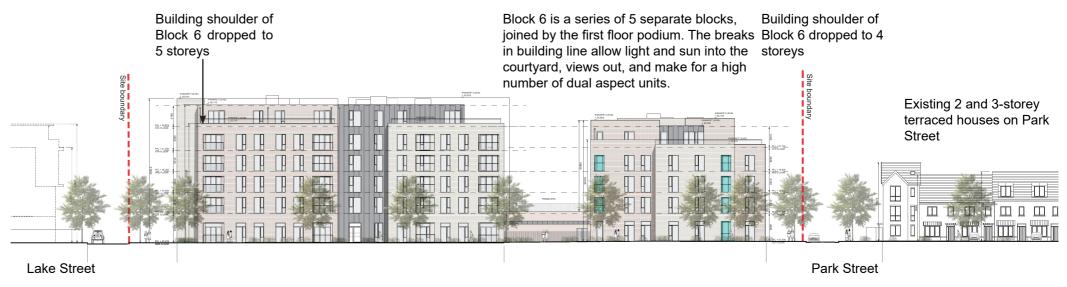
Block 6 North Elevation on Belltree Avenue showing height and massing reduction to west of block at Park Street
